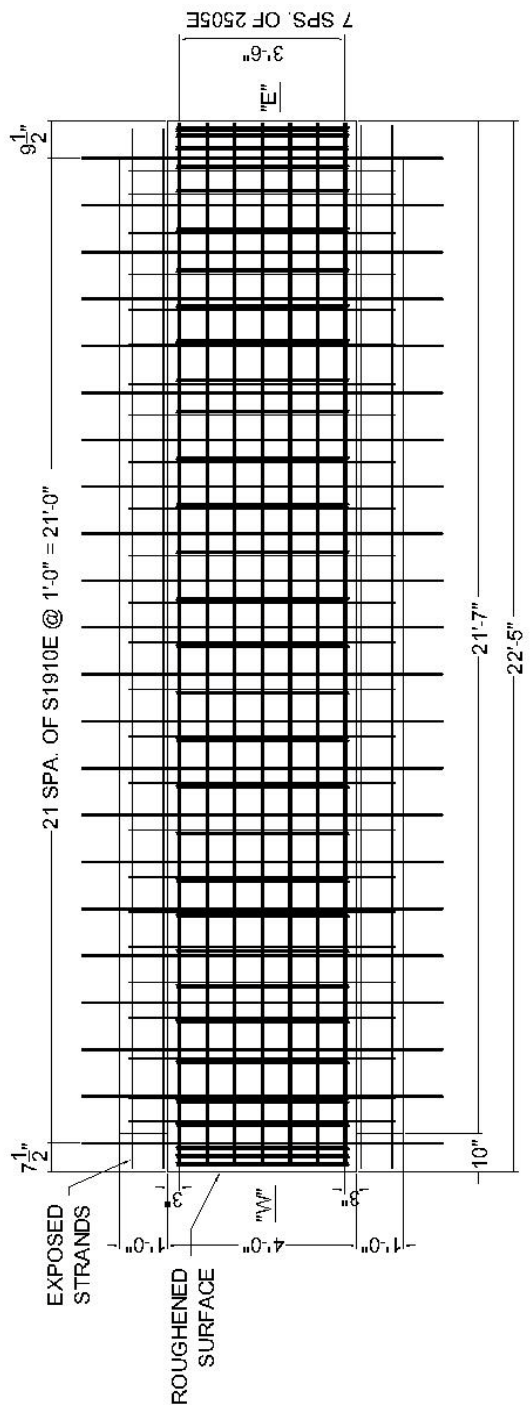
Cross section and individual reinforcement details at midspan of precast beam 2S
